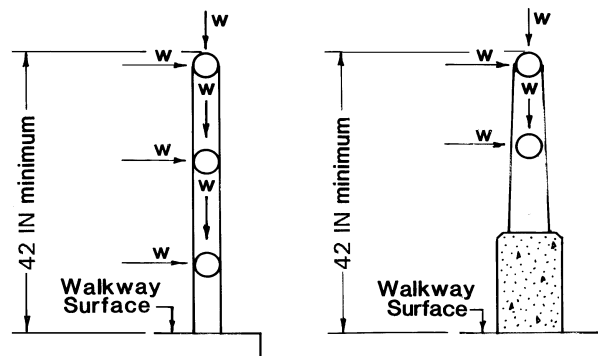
Pedestrian Railing Loads—To be used on the outer edge of a sidewalk when highway traffic is separated from pedestrian traffic by a traffic railing. Railing shape illustrative only.
